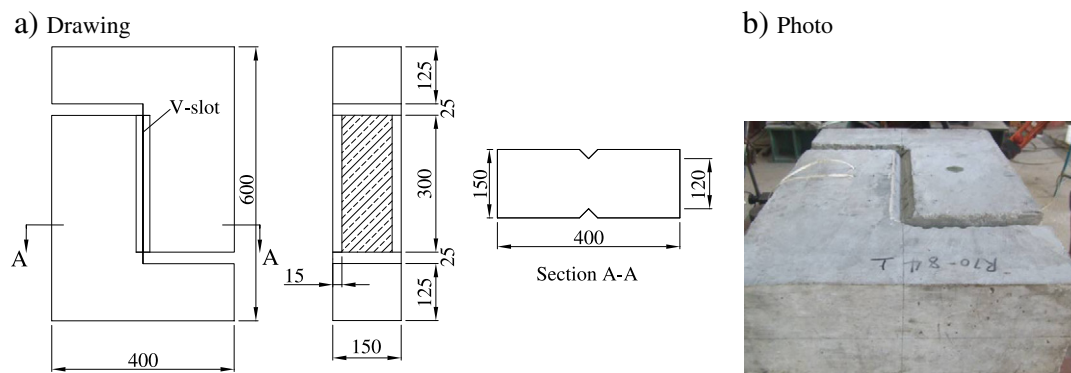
Geometry and dimensions of the shear push-off specimens.
